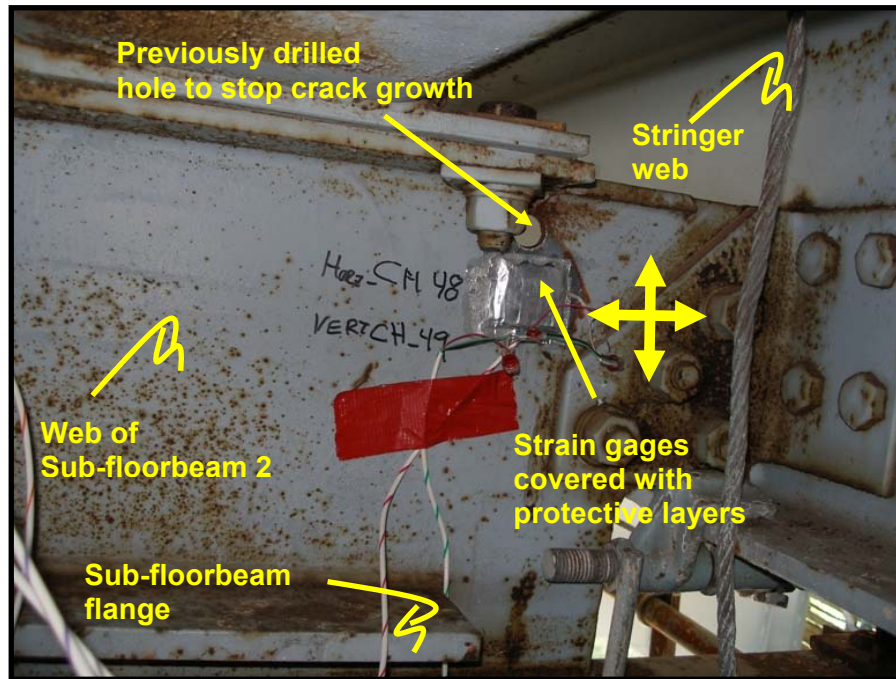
Horizontal strain gage CH_48 and vertical strain gage CH_49 installed on the south face of the web of the Sub-floorbeam 2 in Span 38.
